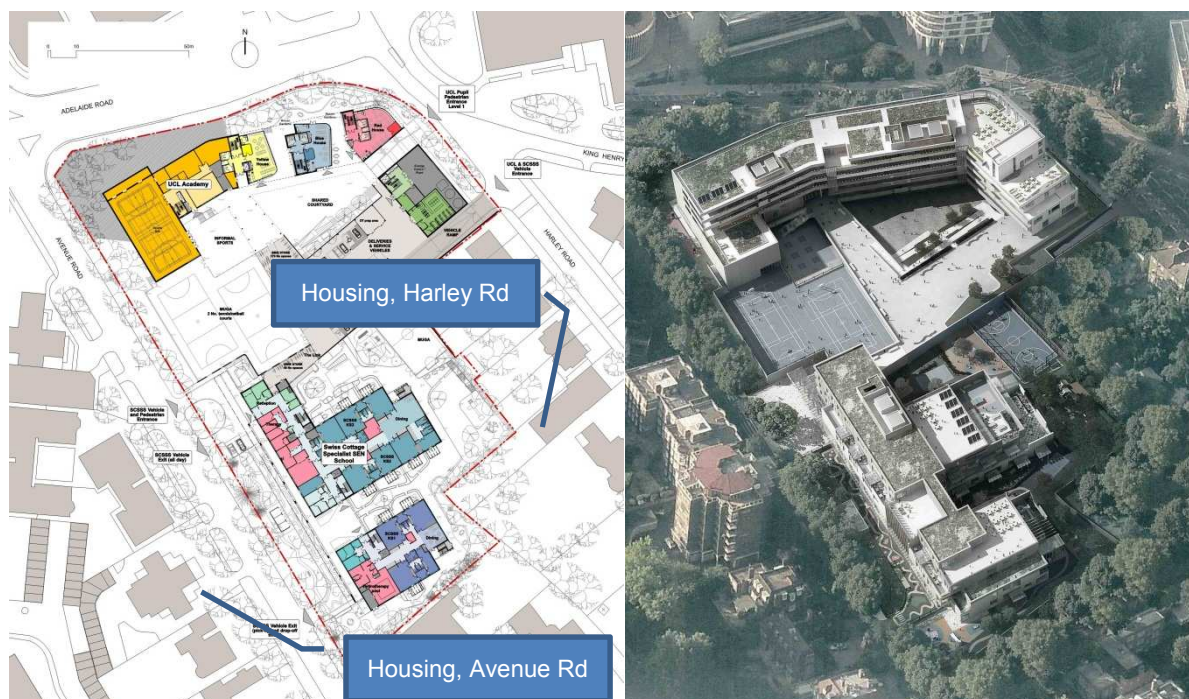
Site layout drawing (excerpt from AR-Arch 1000) and illustration of proposals in context
